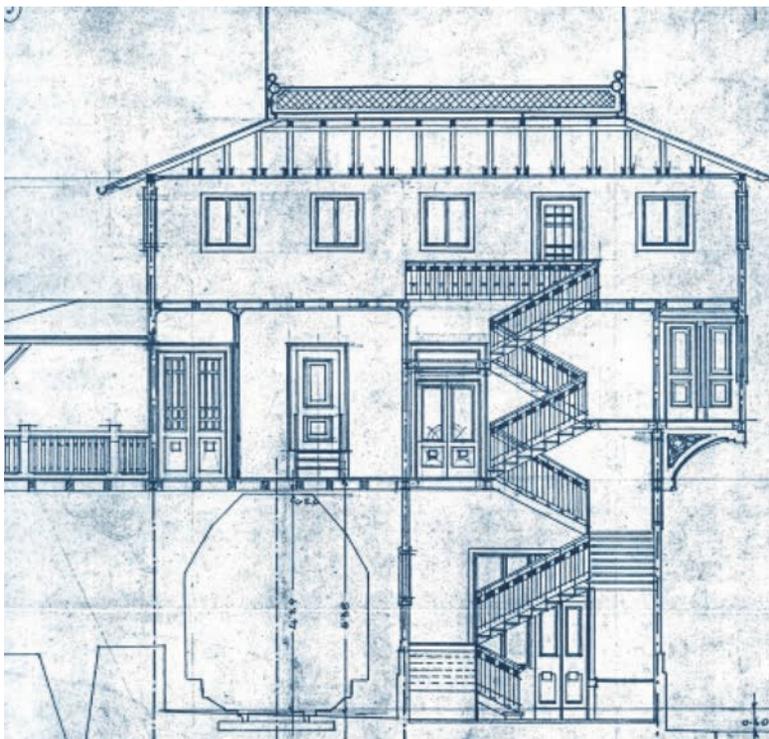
Quarnero Bath, transverse section through central staircase tower, realized as steel and timber structure [25]
